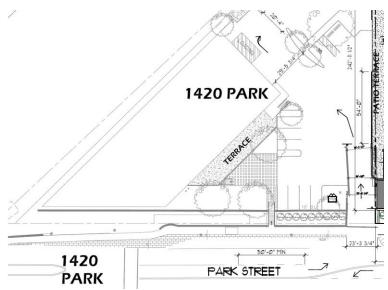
Previous iteration of the site plan showing pedestrian connection to Park Street – Lifecare Design submitted to the Planning Division in 2018
